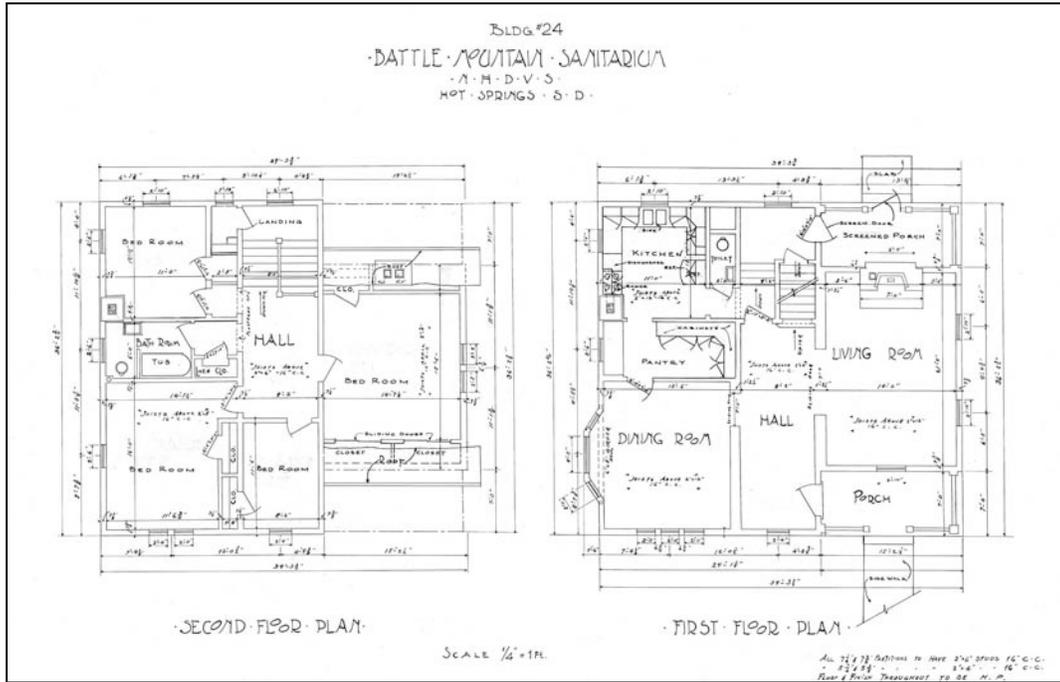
Record Drawings Copying Original Floor Plans, Building No. 24 (12 February 1953)
